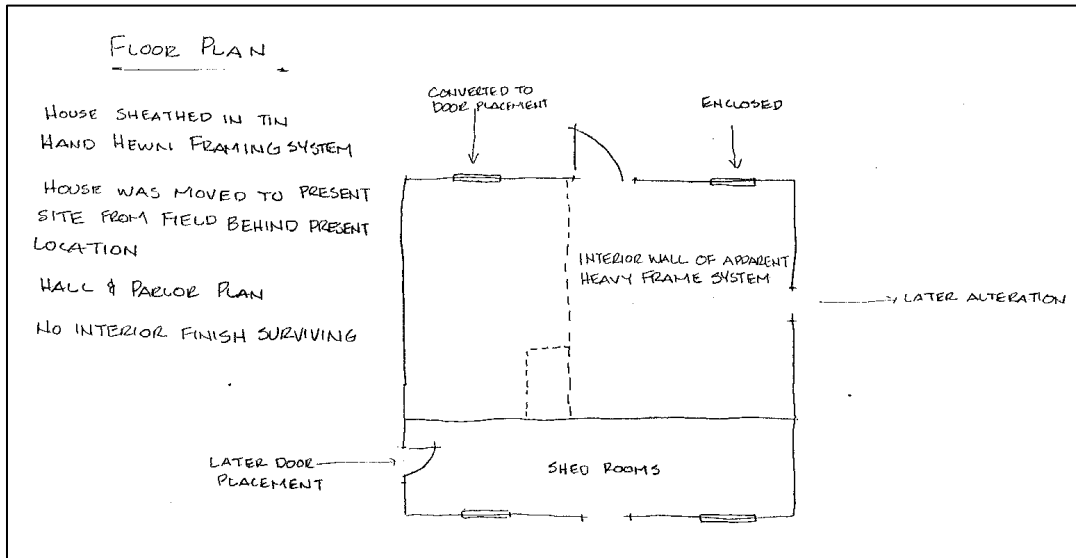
Floor plan of former house oriented with south at top (source: Power 1987b)
